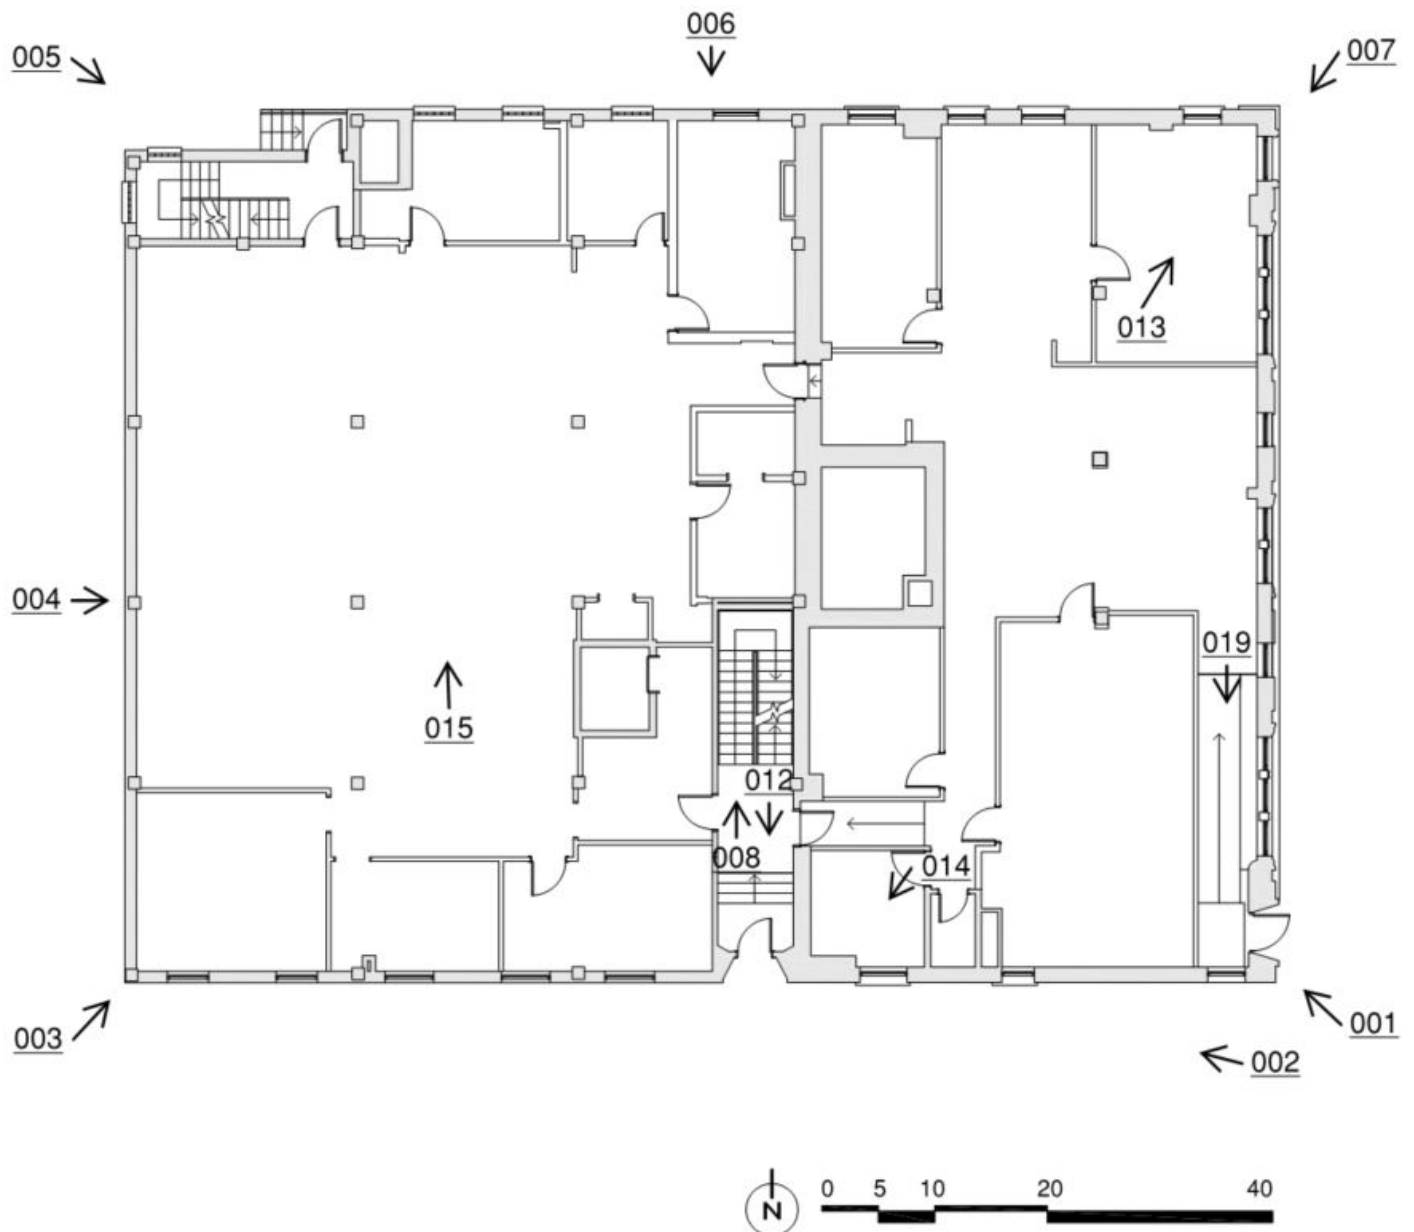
First Floor Photographic Key Plan. Alley Poyner Macchietto Architecture, Omaha, Nebraska, 2021
